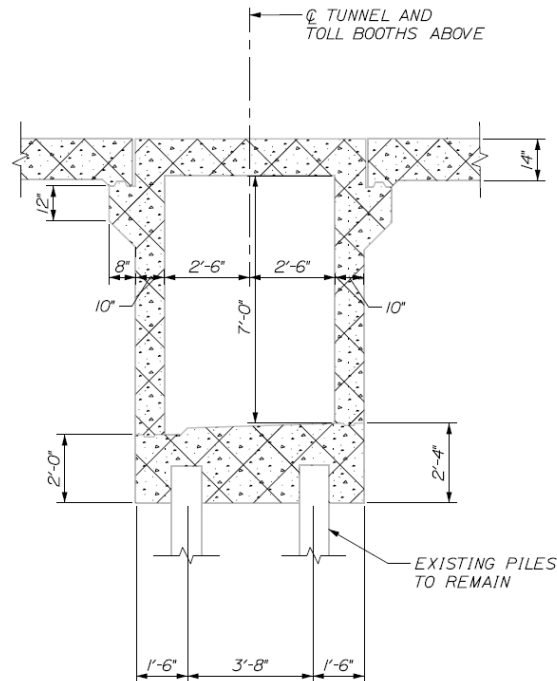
Demolition Plan of Existing Toll Plaza
